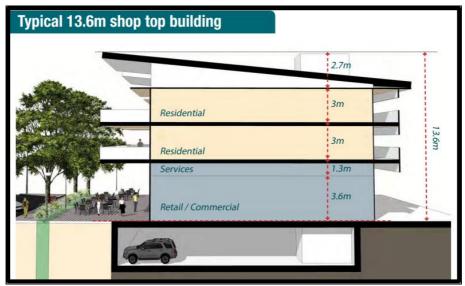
Example of Ground Floor Retail and Shop Top Housing
